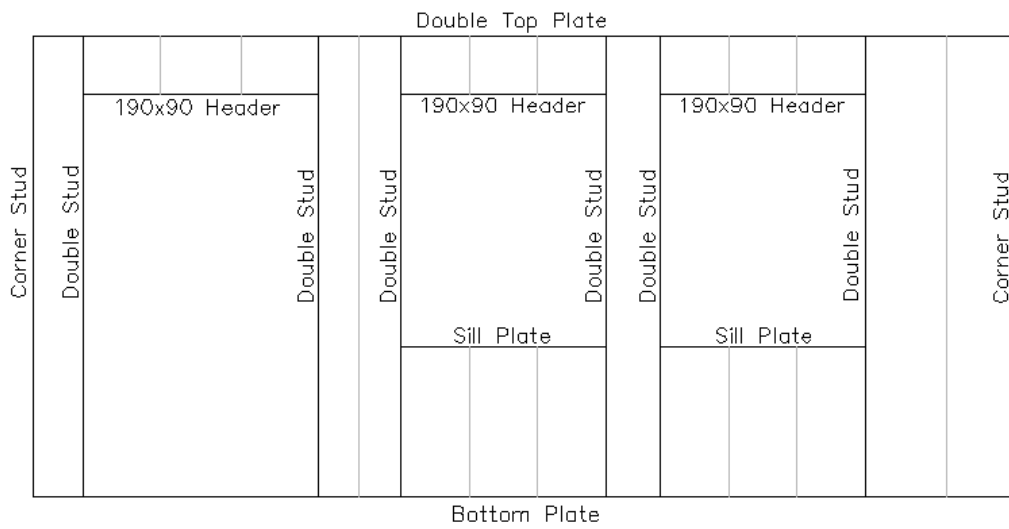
Example Frame Section Assignment for Wall 2 – All connections are pinned
